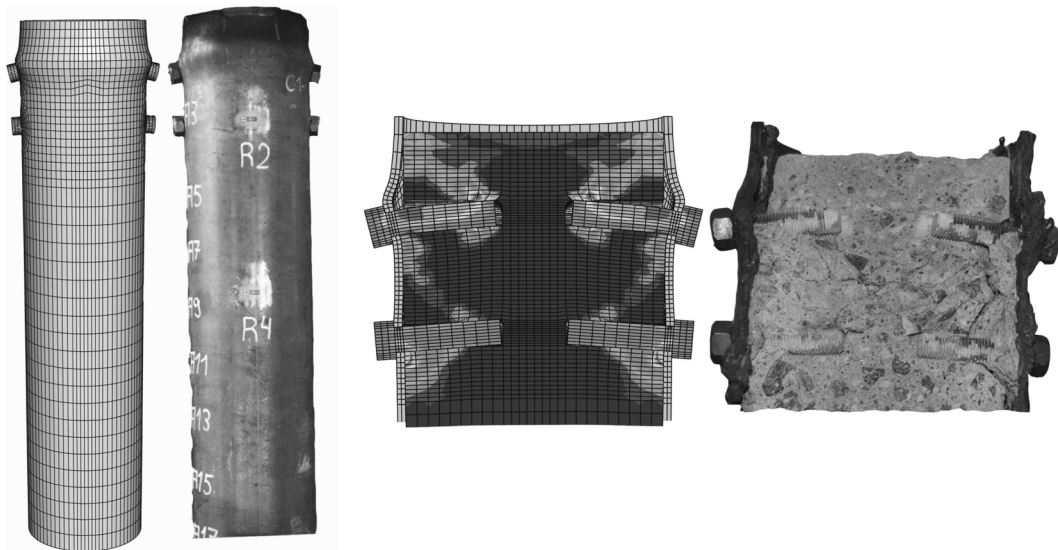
Failure of specimen with shear connectors (numerical/experimental)
